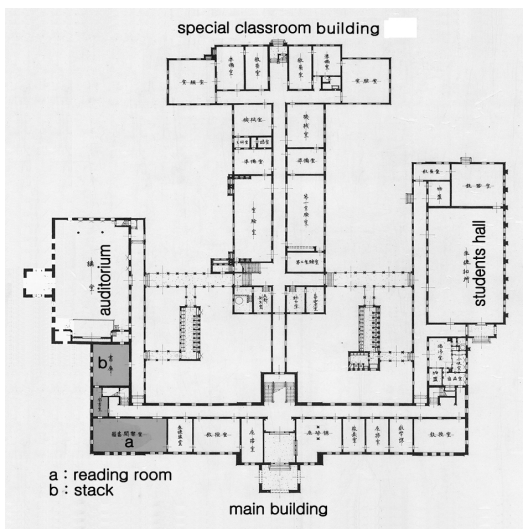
1<sup>st</sup> Floor plan of Main building complex (main building+ auditorium+ students hall) with special classroom building [18]
